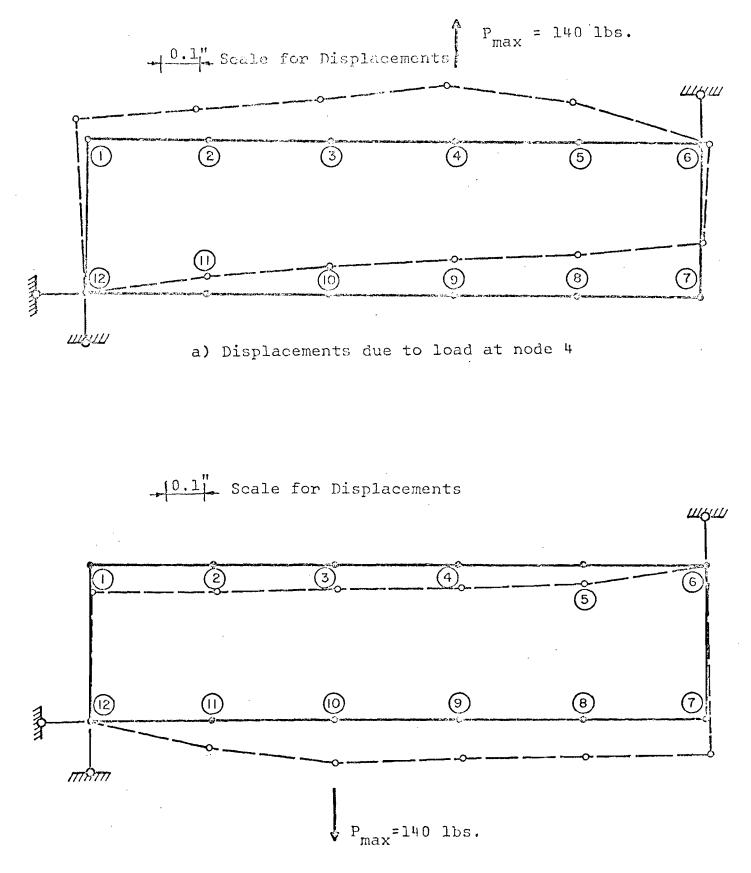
Deformation of Corrugated Panel under In-plane Longitudinal Load
